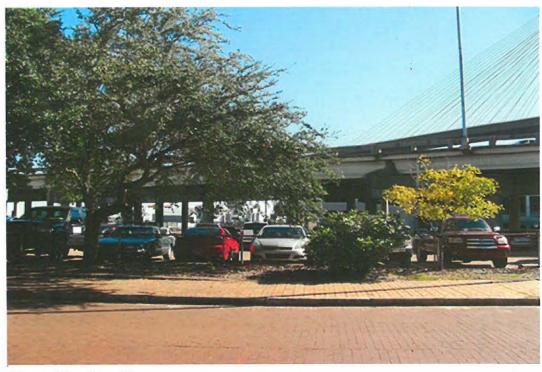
Church Street East Historic District looking east from Ft. Condè toward the existing Water Street interchange ramps and Alternative B' (Preferred) rendering.
